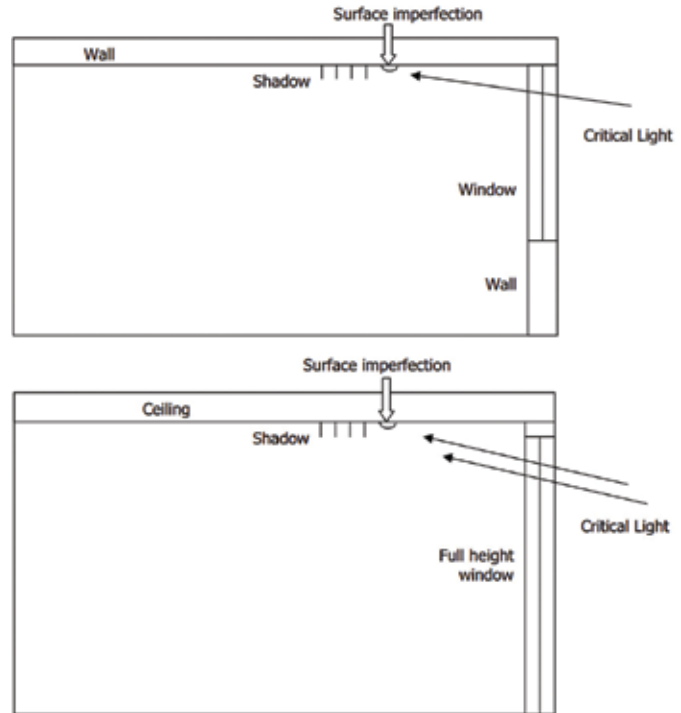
Critical lighting can occur indoors when windows or openings extend to intersecting ceilings or walls (from Reference 6)
